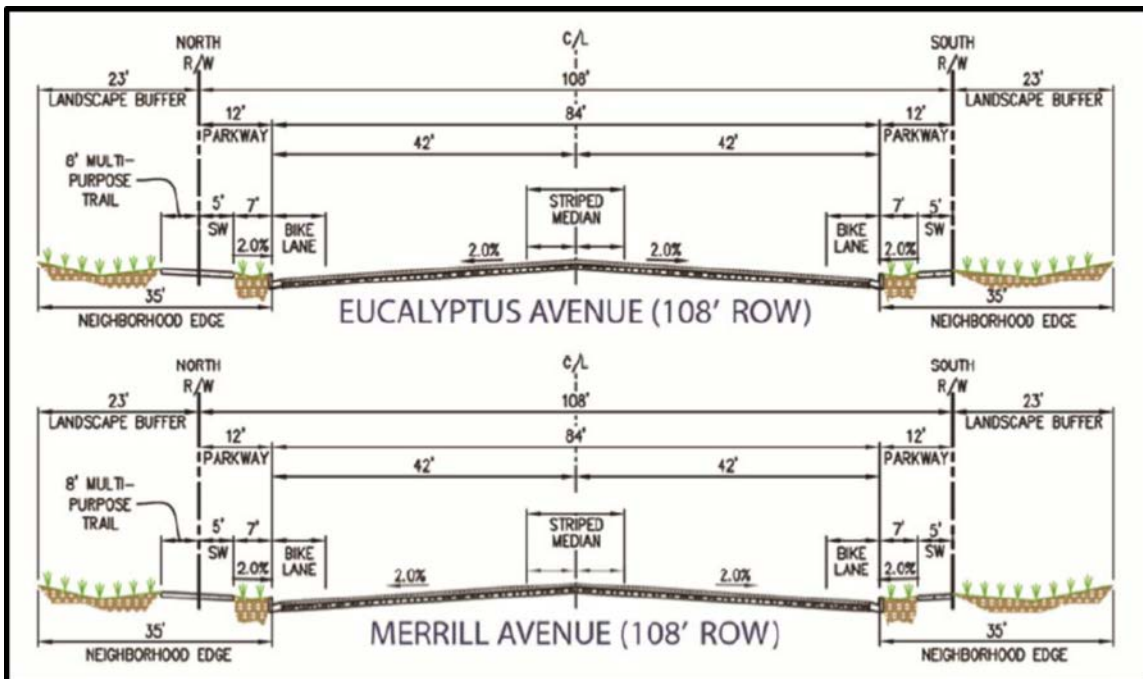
Merrill and Eucalyptus Avenues Street Cross Sections
